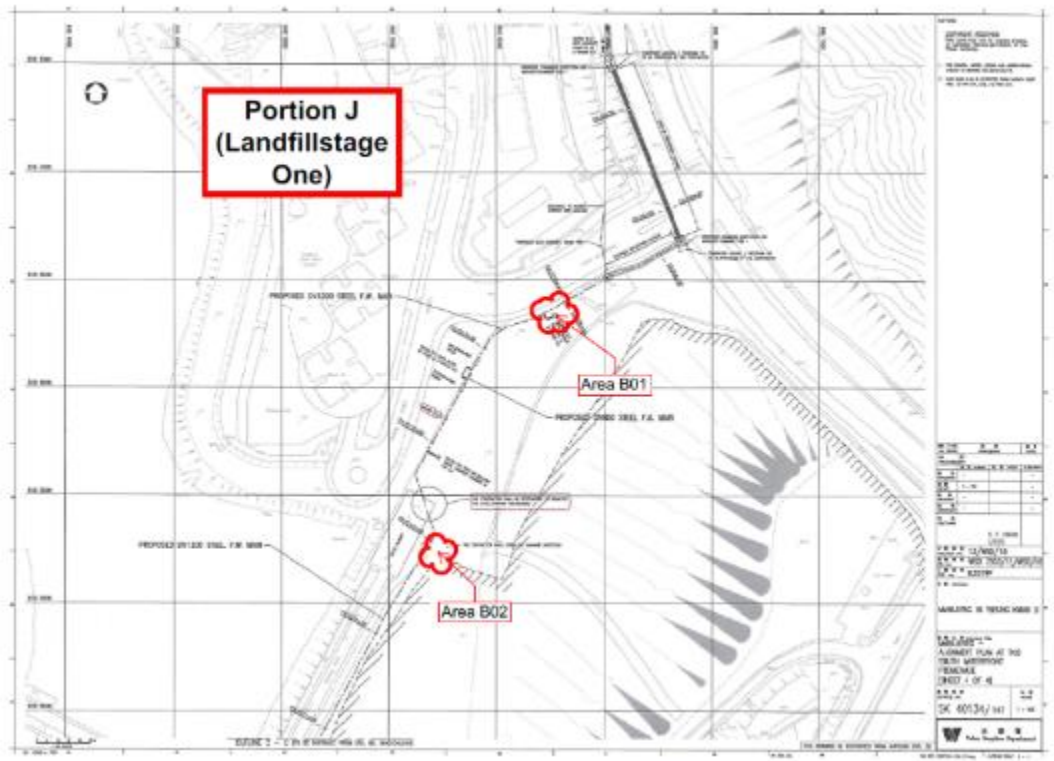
Location Plan – Landfill Stage 1 (Area B01-B02)
